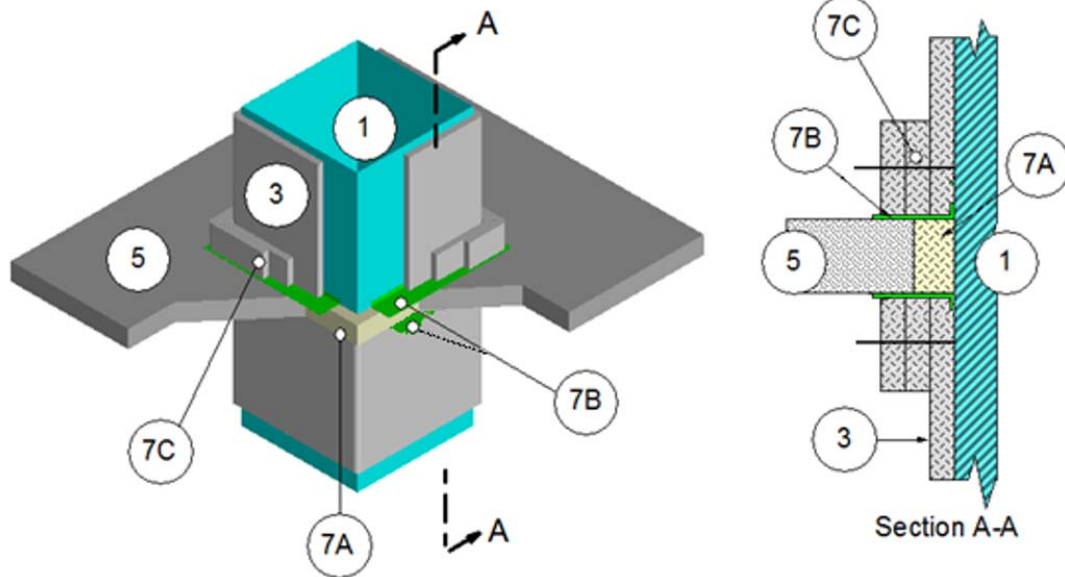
Penetration Assembly, Duct Through Floor/Ceiling
